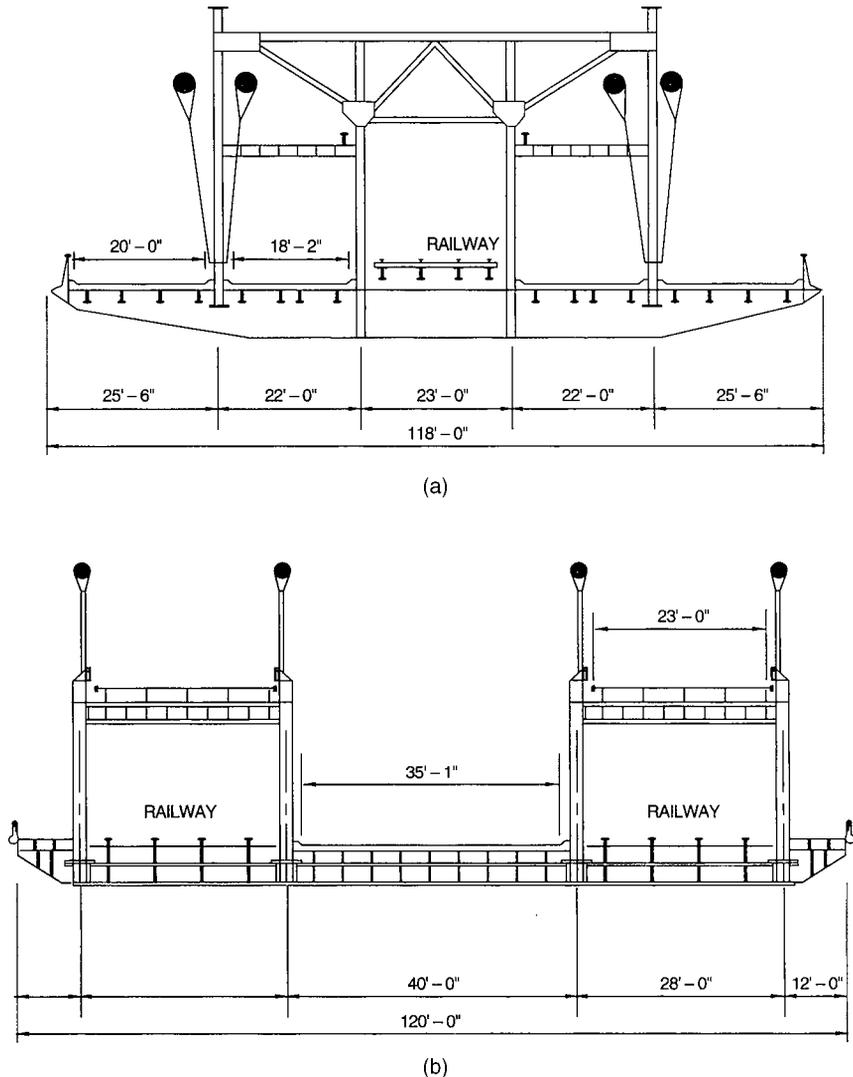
Position of rail loading on two suspension bridges. (a) Williamsburg Bridge. (b) Manhattan Bridge.
